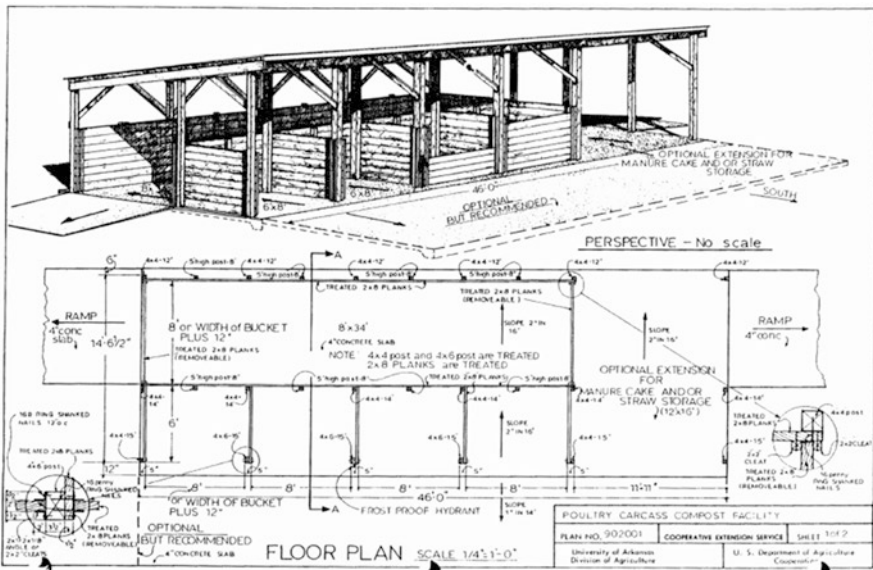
Bird's view and floor plan of a two-stage in-bin composting system [236]
